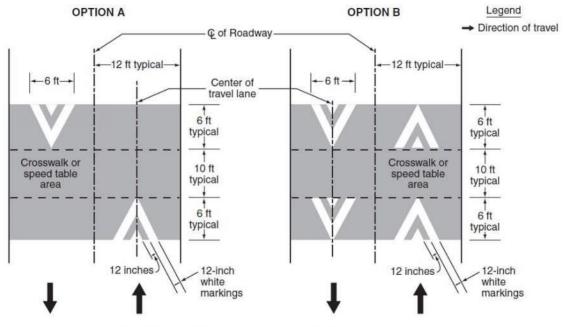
Approach Slope Markings for Raised Pedestrian Crossings
